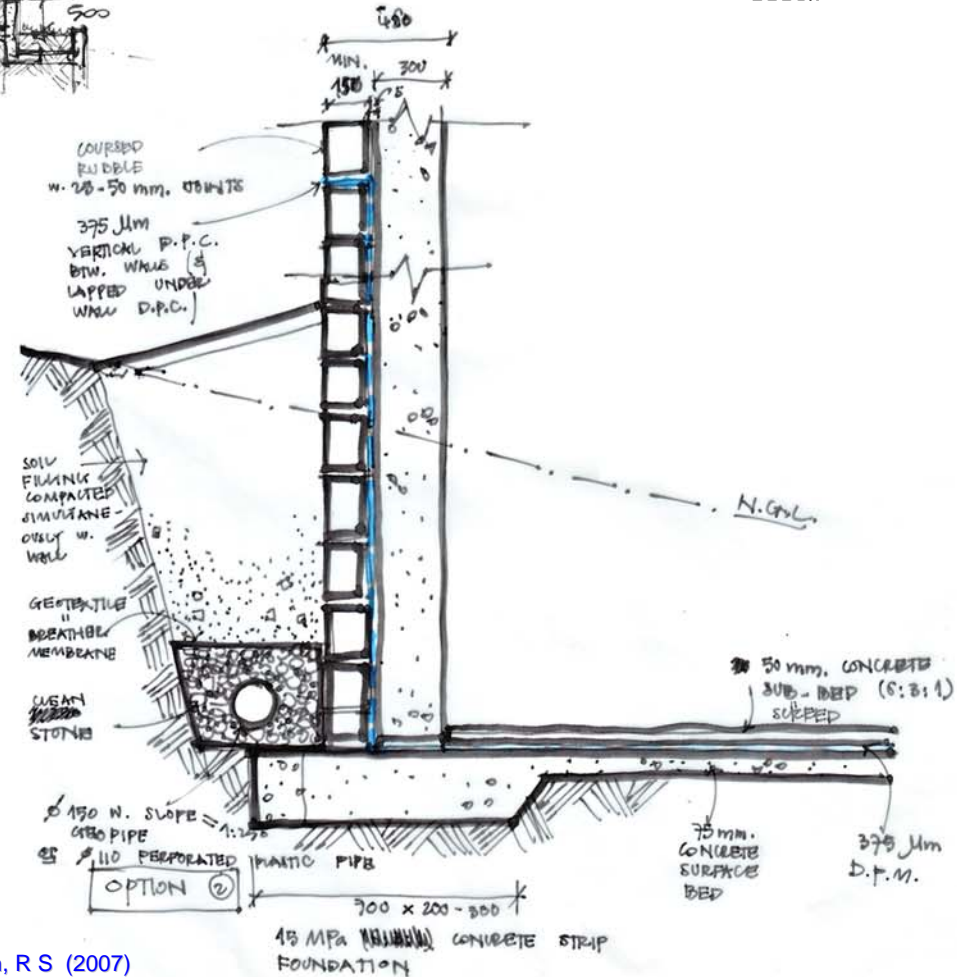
RETAINING WALL INVESTIGATIVE SECTION 1 (AUTHOR, 2006).
